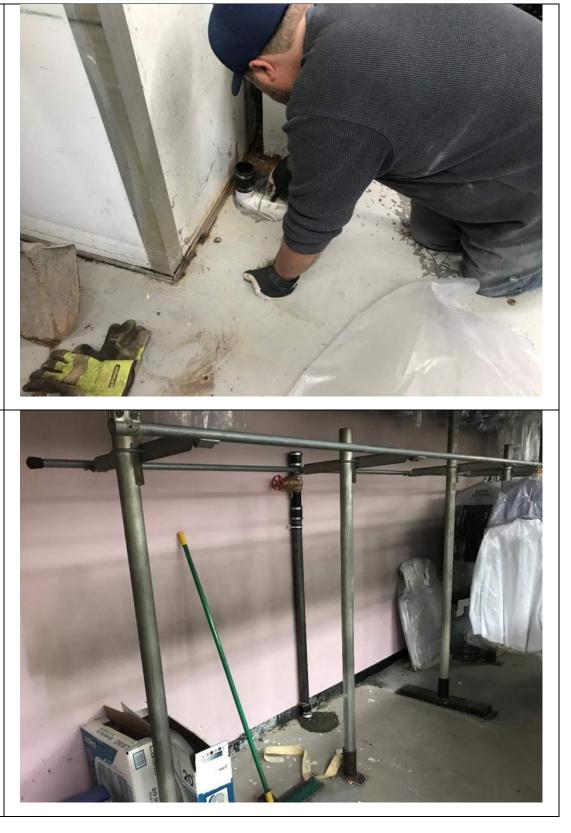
Placing 40 mil polyethylene sheeting above backfilled Sakrete All-Purpose Gravel at VEP-15 prior to pouring concrete for slab repair, facing west.
